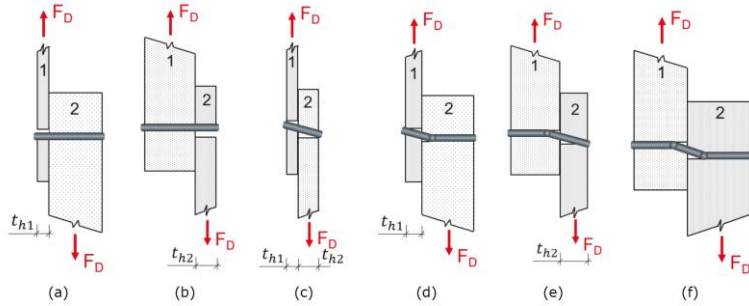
Failure modes for timber-steel connections according to EC5-2
